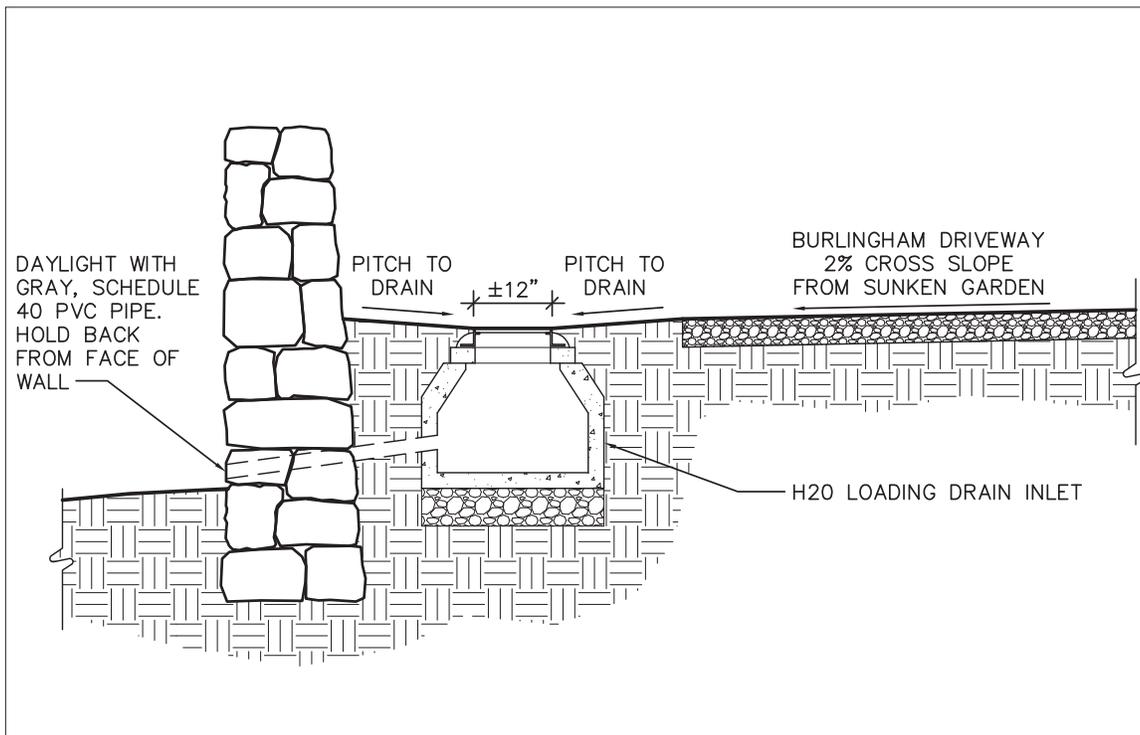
Schematic section showing rehabilitated and improved drainage at the Burlingham driveway. The service life of the driveway's paving can be increased by maintaining a cross slope from the Sunken Garden and by installing a small drain inlet at a low point between the south edge of the drive and the stone wall, 2012 (OCLP).
